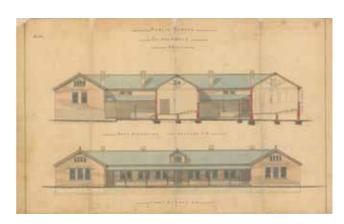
Chippendale Public School. Back and front elevations, (undated). NRS 4335
